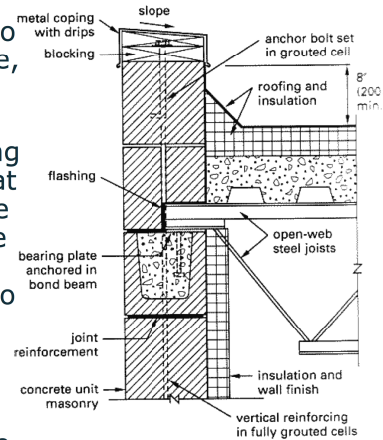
Reinforced, Grouted Concrete Masonry Wall
